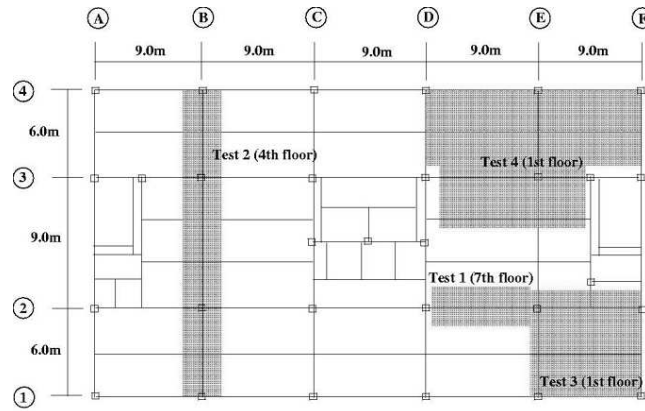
Plan of Cardington test building showing location of the British Steel fire tests [?]
